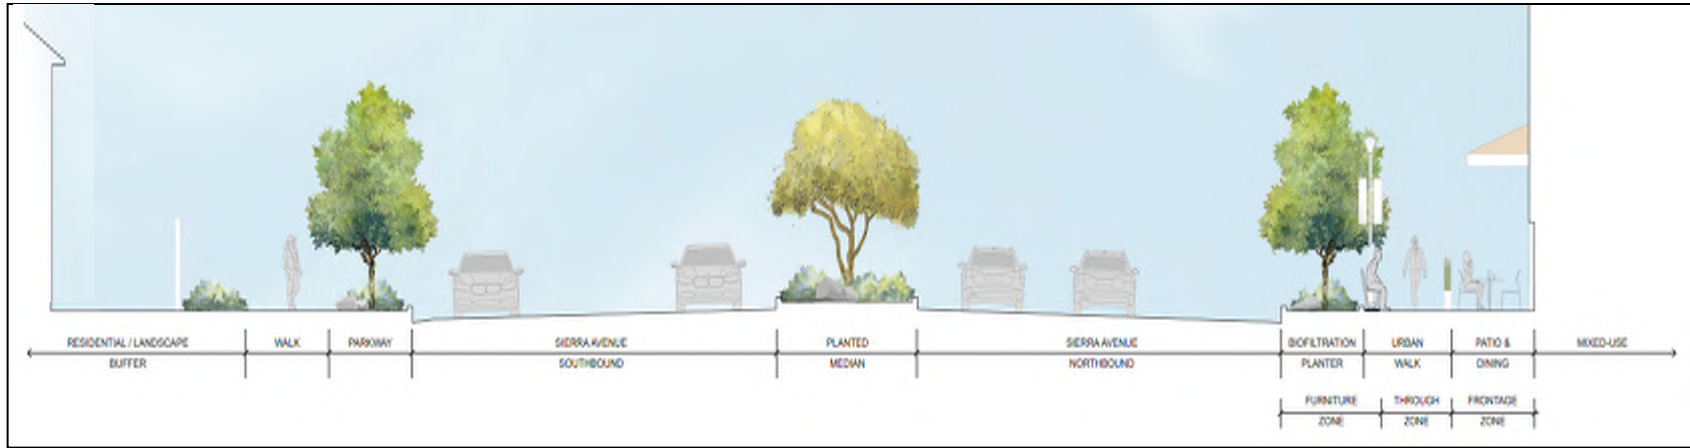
Conceptual Site Elevations – Gateway North Sub-District
